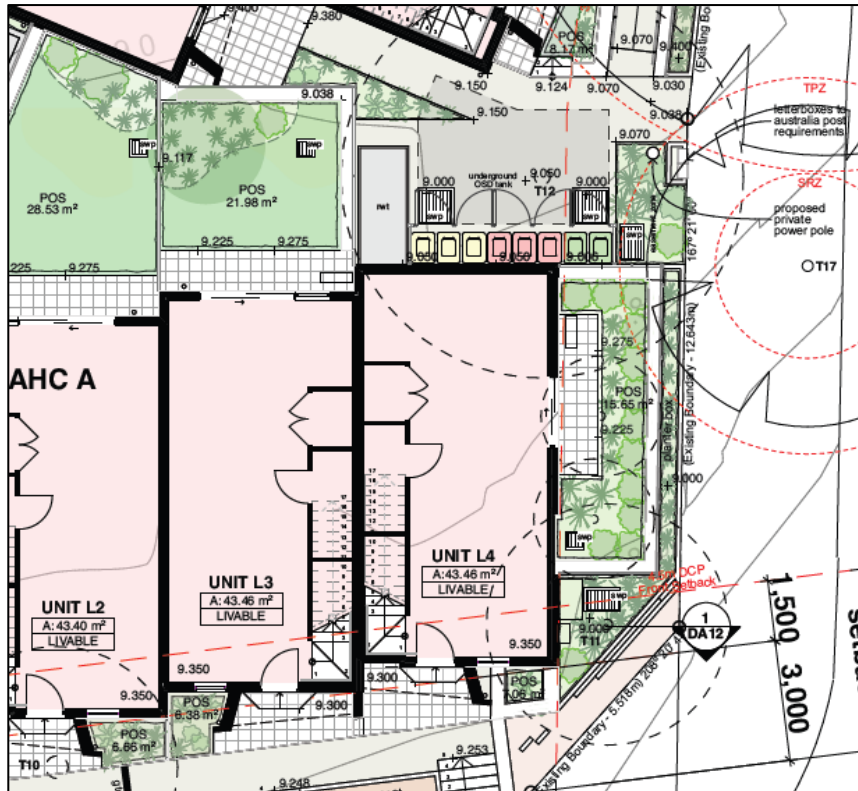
Partial site plan showing initial waste storage and Unit L4 private open space
